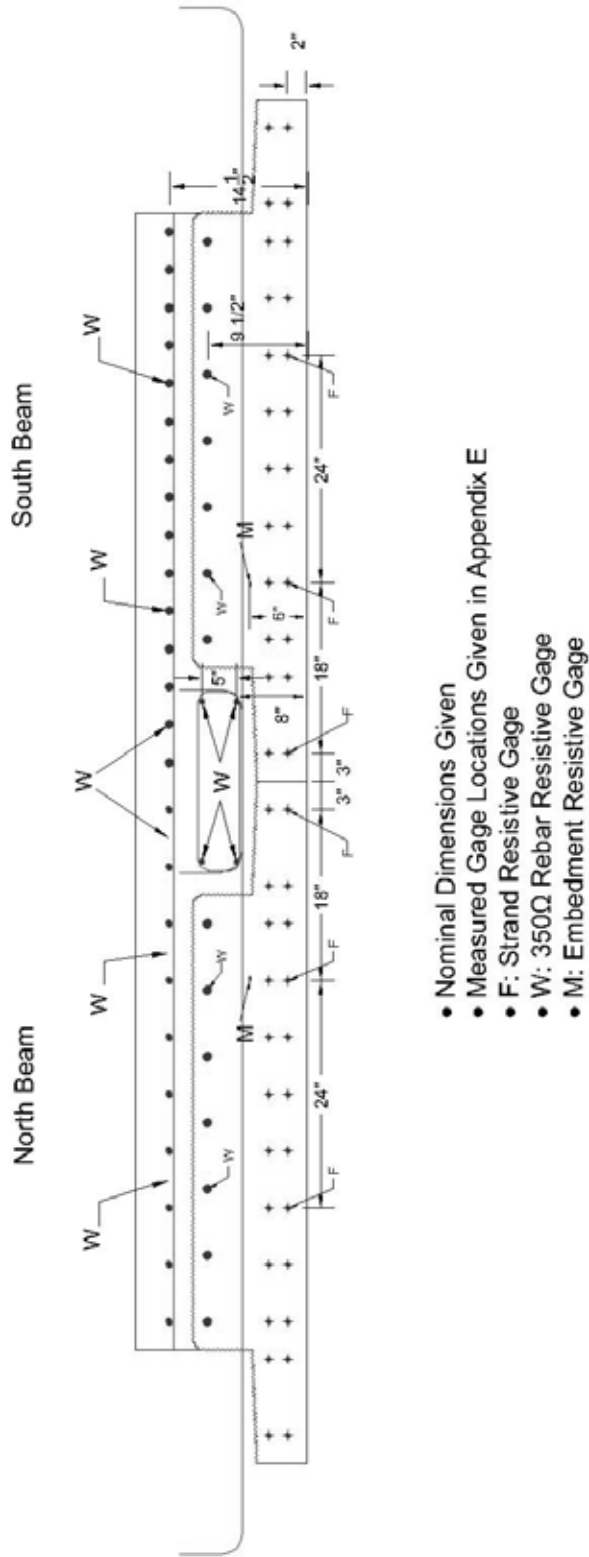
Longitudinal instrumentation layout within the cross section at midspan
